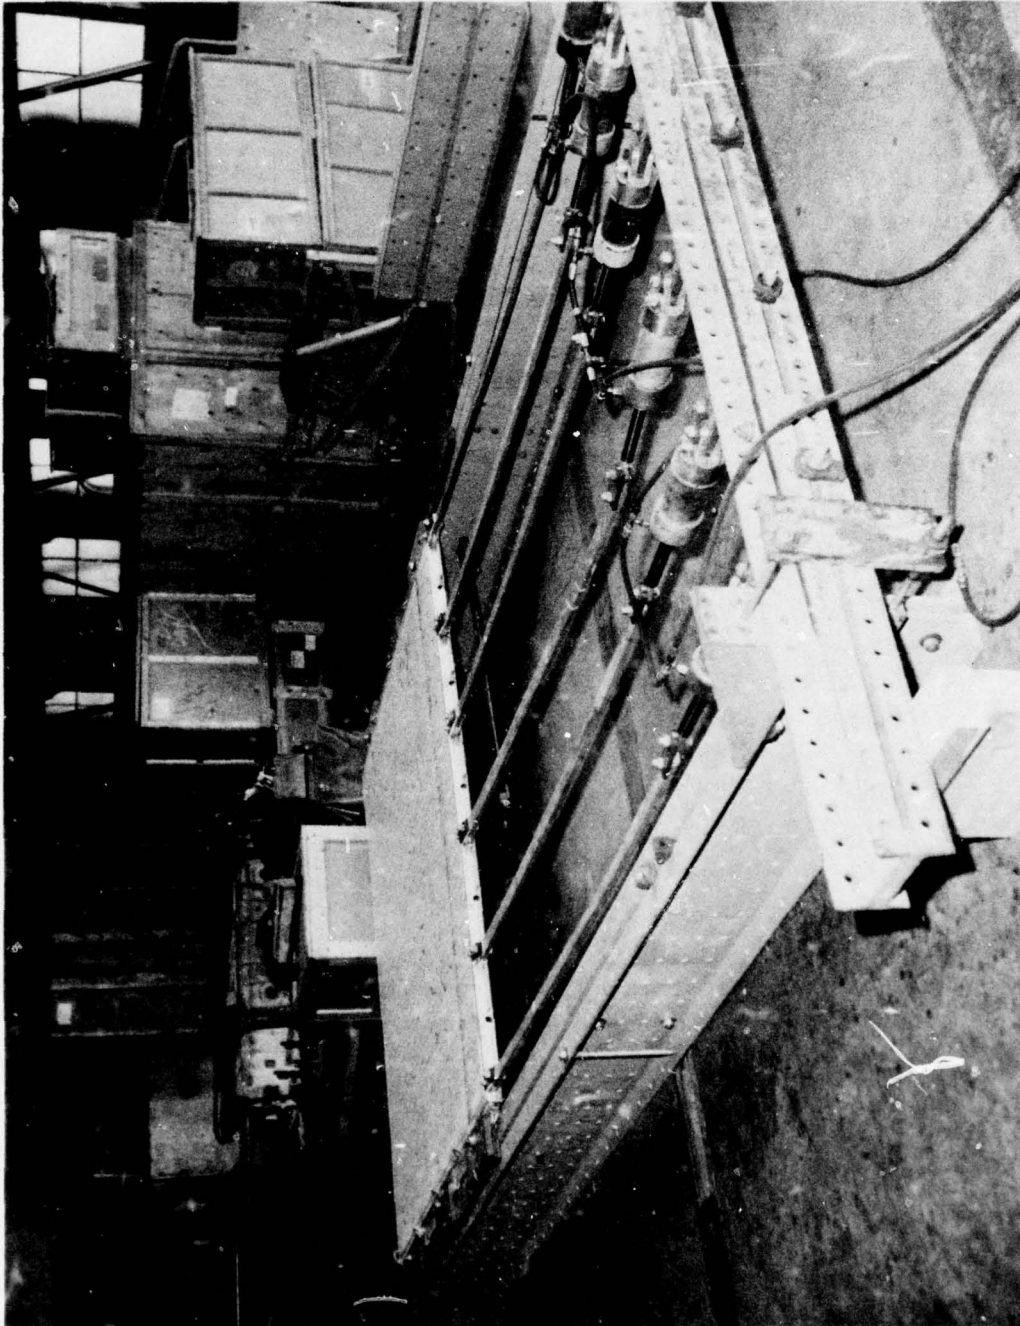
RAIL STRENGTH TEST - HORIZONTAL, 108 INCH
